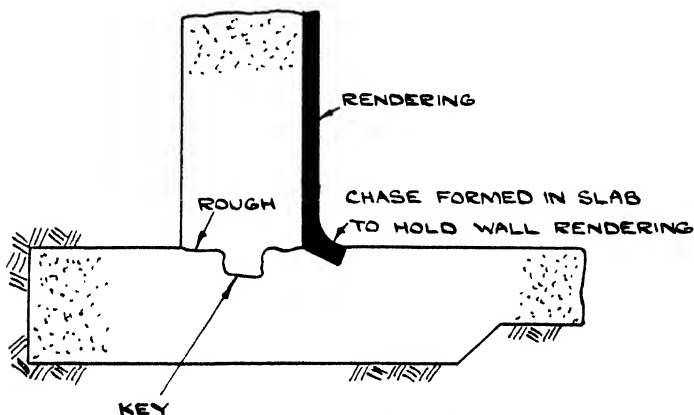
CONSTRUCTION JOINT AT BASE OF MASS CONCRETE WALL
